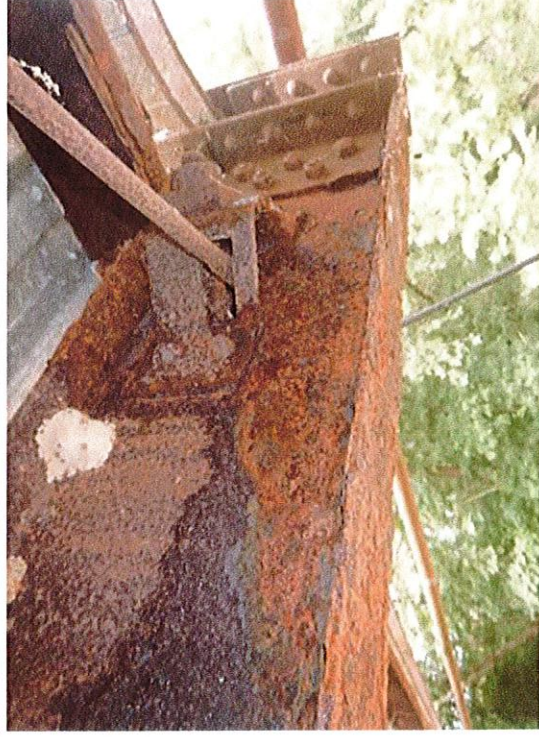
SPAN 4, FLOOR BEAM 3, EAST END: Bottom flange has 40% section loss, web has 1/8" section loss
